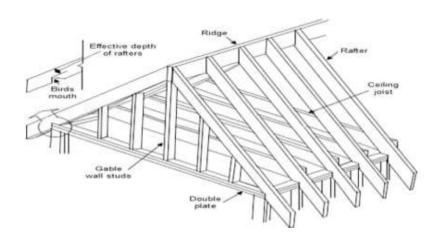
Construction of Gables of roofs of wooden houses, Neelum Valley, (Drawing by Z.Babri)
